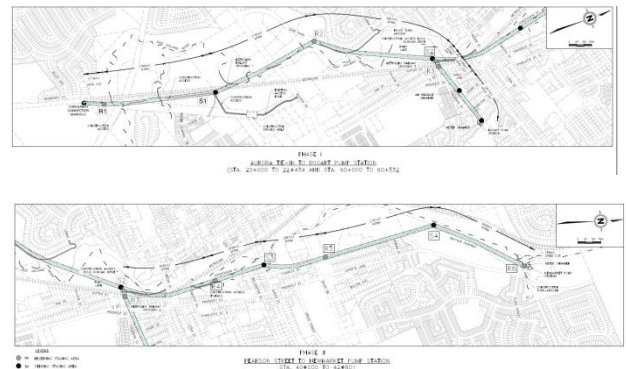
Detailed Design Alignment, Shaft and Tunnel Drive Locations
